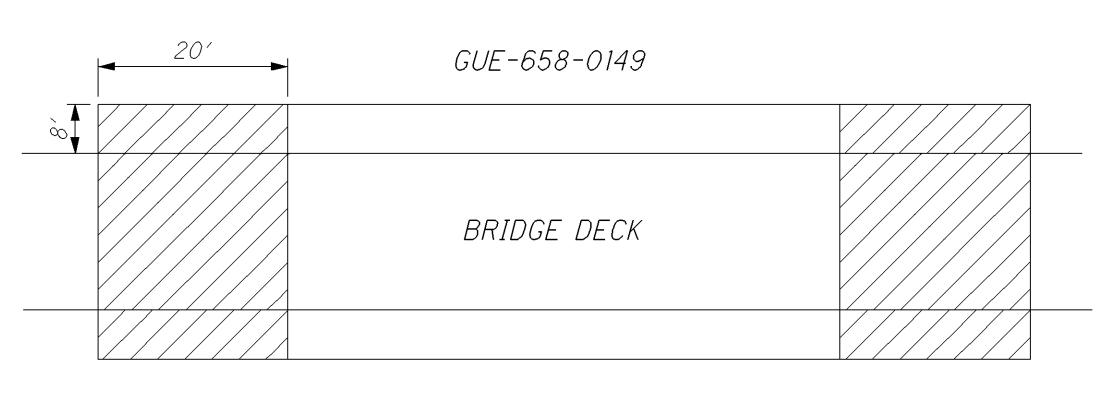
GUE-658-0149: MILL 1.25", PLACE 1.25" SURFACE DETAIL (2) GUE-658-0489: BUTT JOINT AT APPROACH SLABS, TAPER MILL 300' DETAIL (3) GUE-658-0546: BUTT JOINT AT APPROACH SLABS, TAPER MILL 300', PERFORM FULL DEPTH REPAIRS
